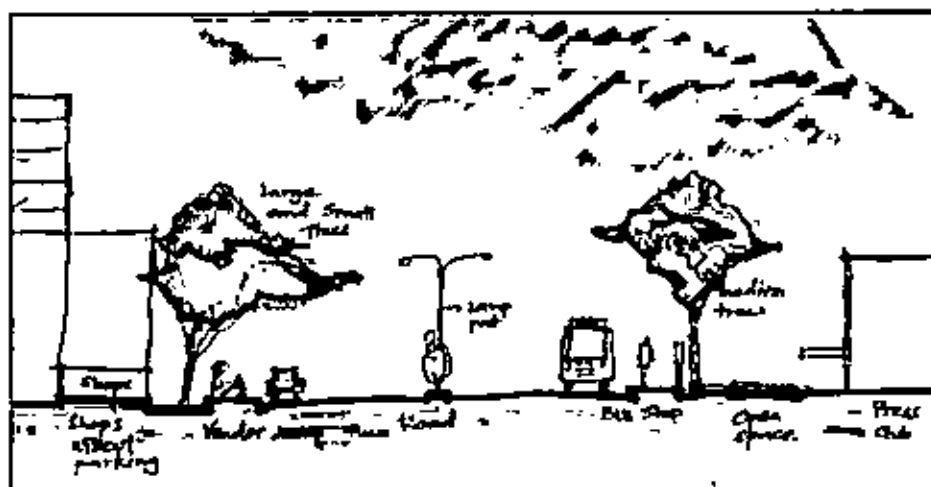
Sectional elevation in between the Press Club and the DAB building.
